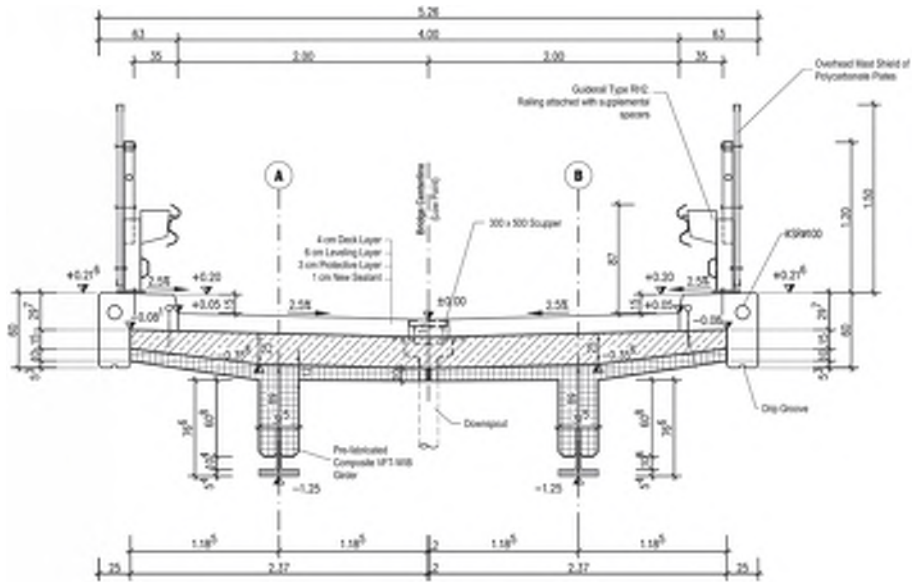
VFT-bridge cross section (Reprinted with permission from Seidl and Braun 2009)
